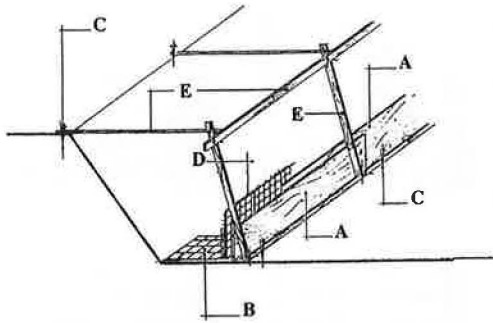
Wrap around with a timber structure: A) timber board; B) geogrid; C) peg; D) turf; E) timber structure.
